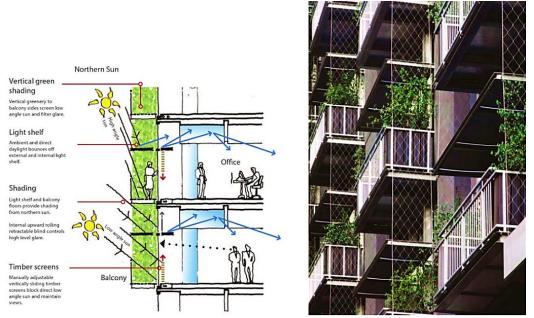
Conceptual diagram highlighting the importance of daylight shading at the north side and climbing plants growing onto metal mesh screens on north façade (Author, 2016)
